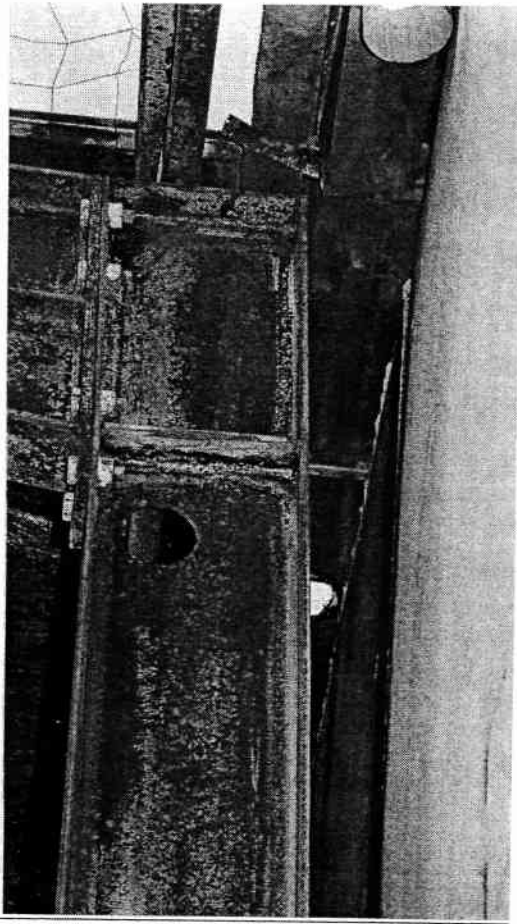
Steel joining plate welds fail at columns meaning tilt slabs are at greater risk of collapse.
